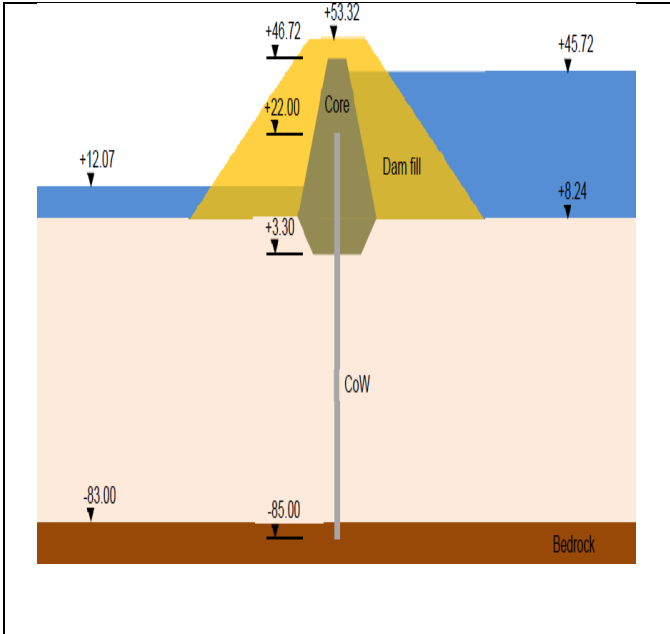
EARTH CUM ROCK FILL DAM CROSS SECTION
